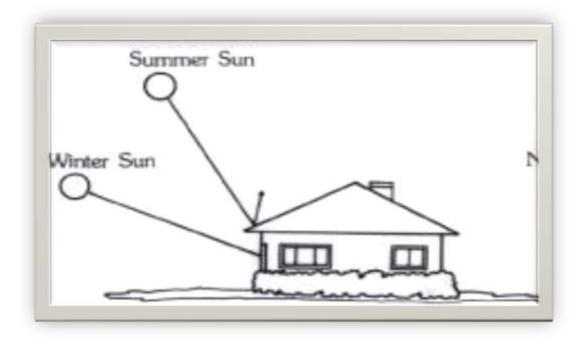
Plate II: Showing a Roof Overhang Protecting the House from the Sun
